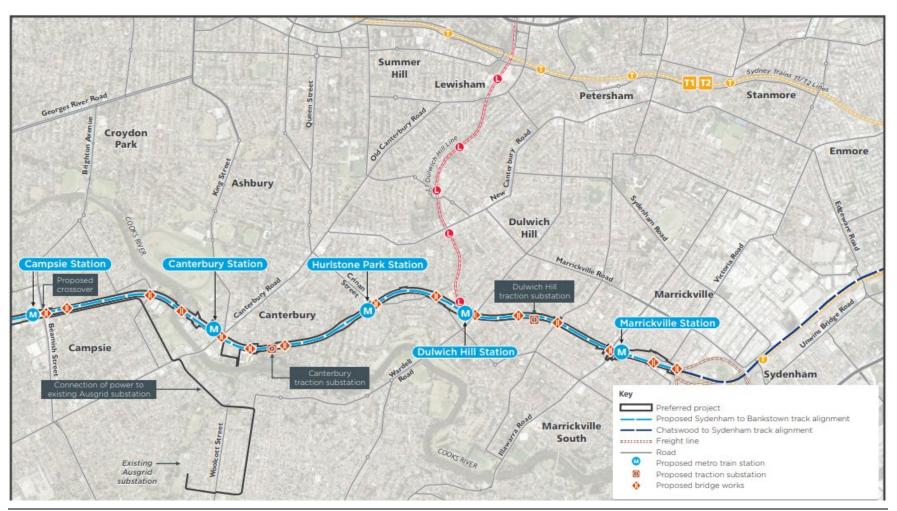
Site Layout (source: Sydney Metro City & Southwest - Sydenham to Bankstown - Submissions and Preferred Infrastructure Report, 2018)
